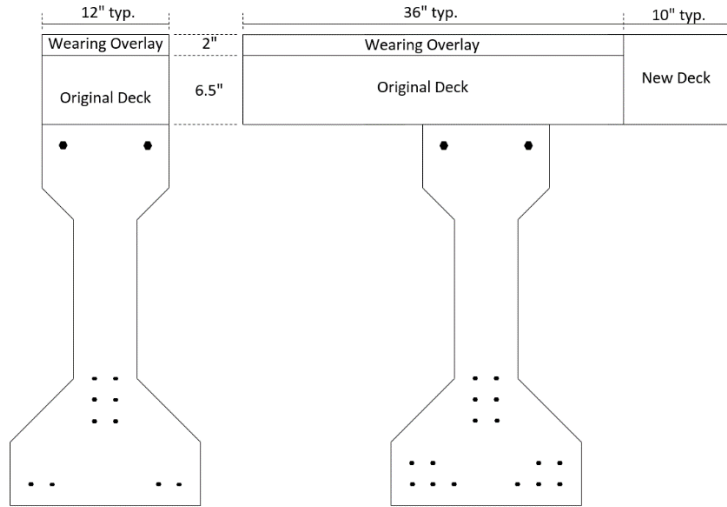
Details of remaining deck on girders A (left) and C (right)
